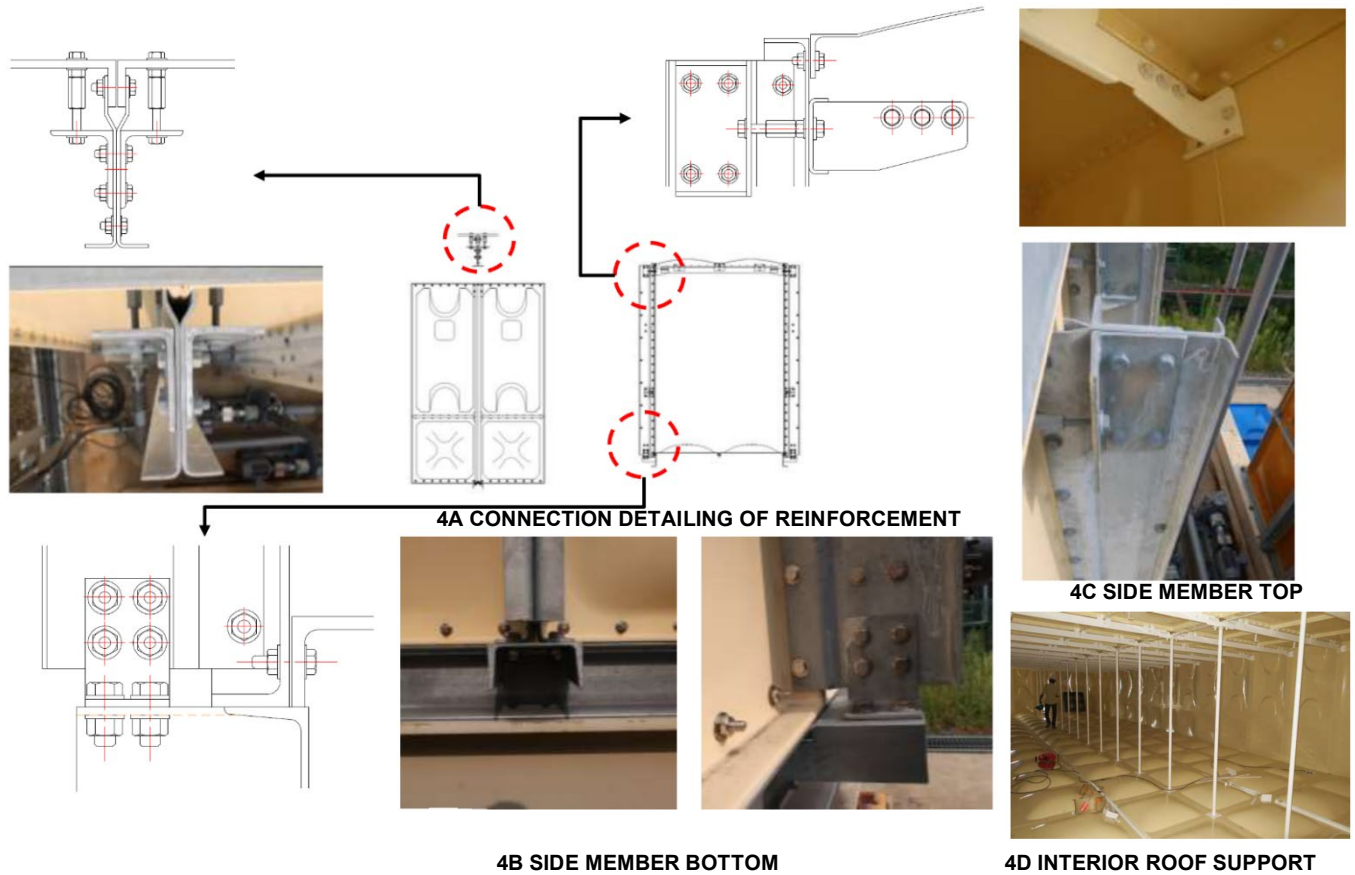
STEEL REINFORCEMENT FOR 3M TANK CONFIGURATION
